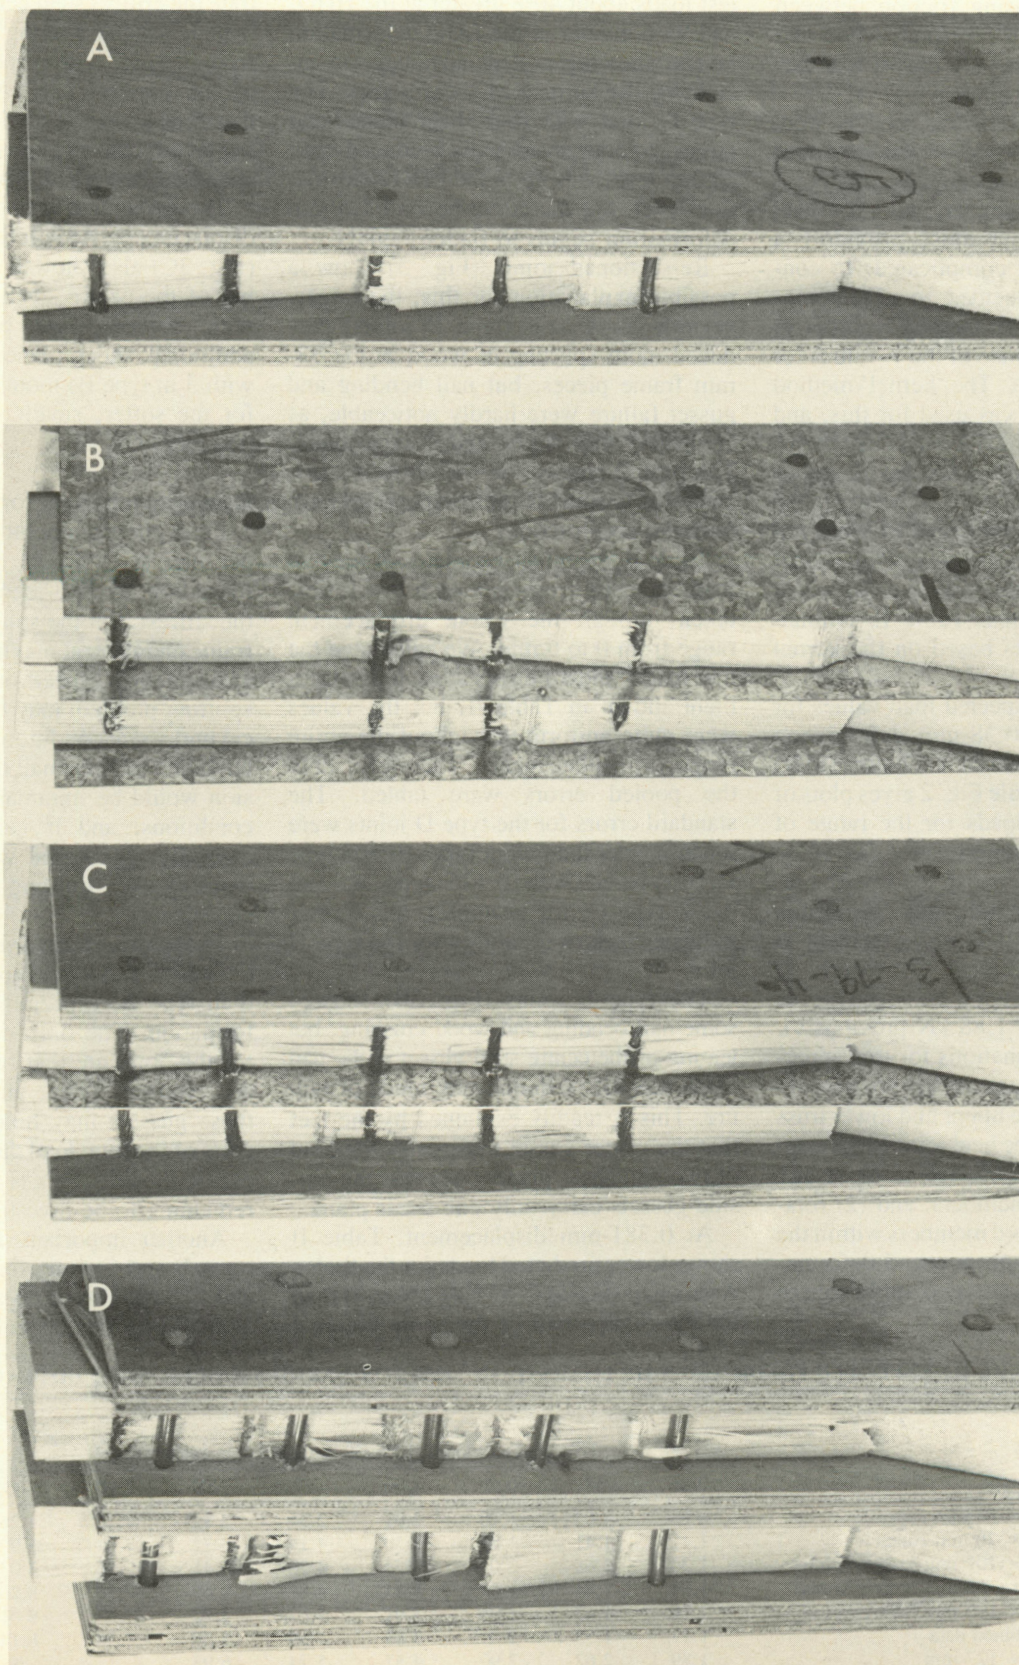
Four nailed joint treatments, after loading to failure; lower chords were split away to show modes of failure.
